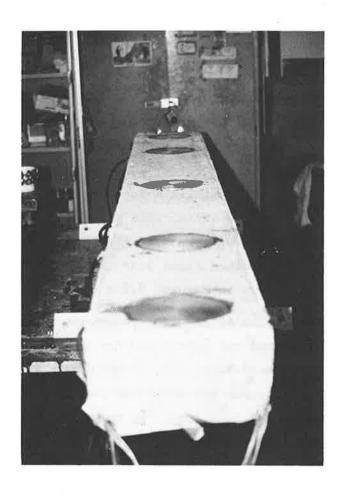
SOIL PRESSURE GAGES AND BEARING PLATES INSTALLED IN CROSSTIE BOTTOM SURFACE
